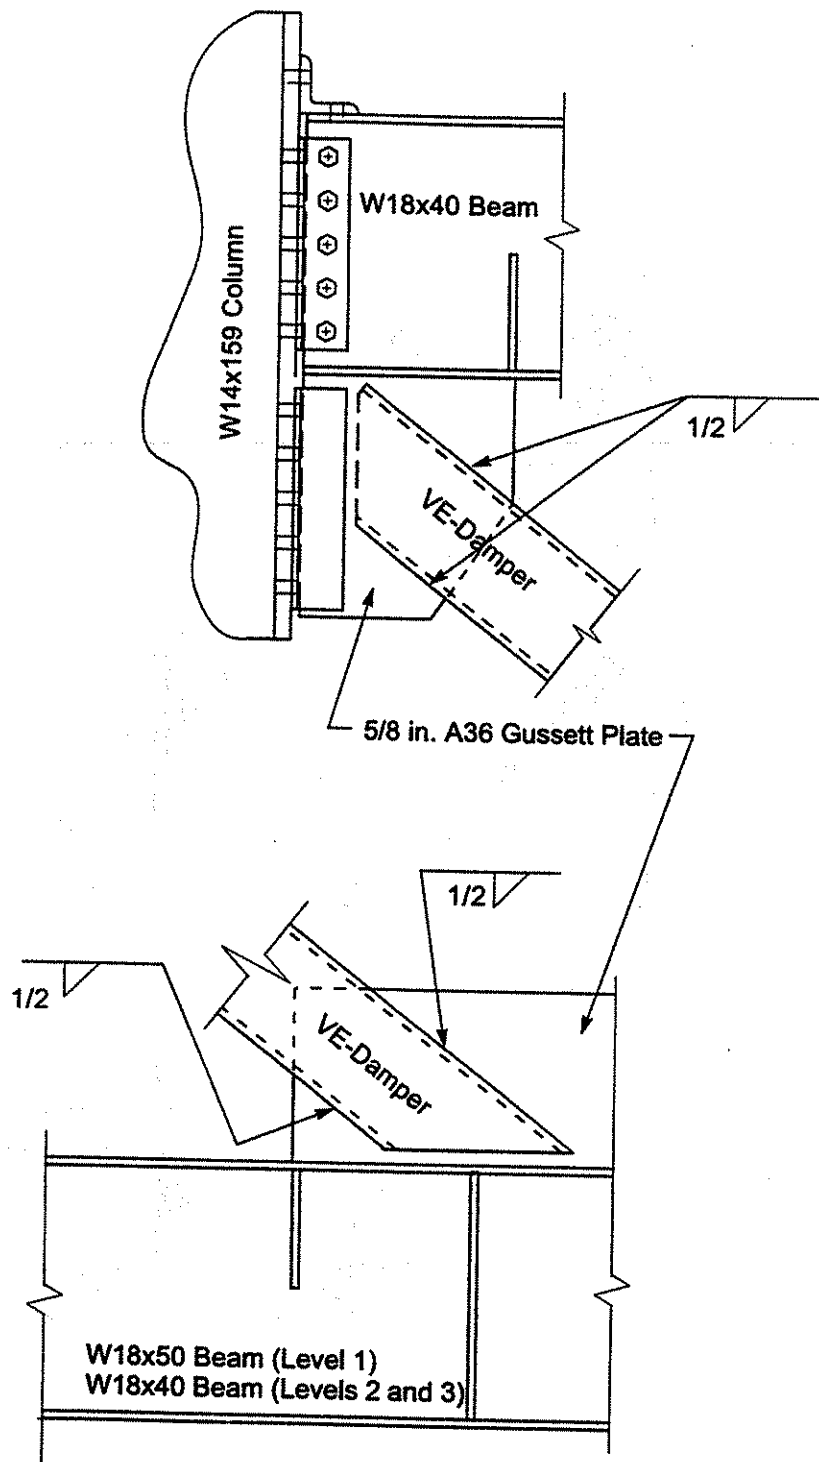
Damper connections to beam-column and beam at midspan.
